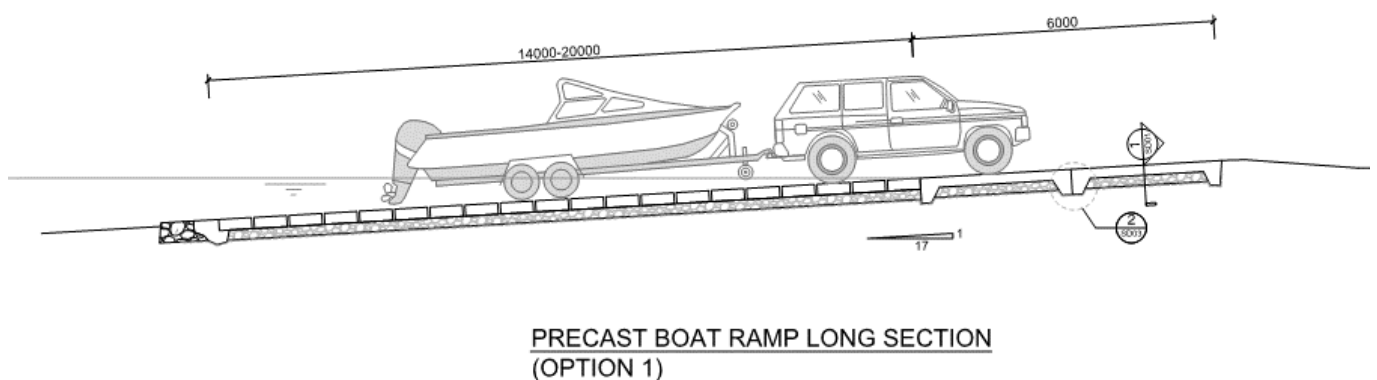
Proposed Boat Ramp – Option 1 – Precast Panel Ramp
